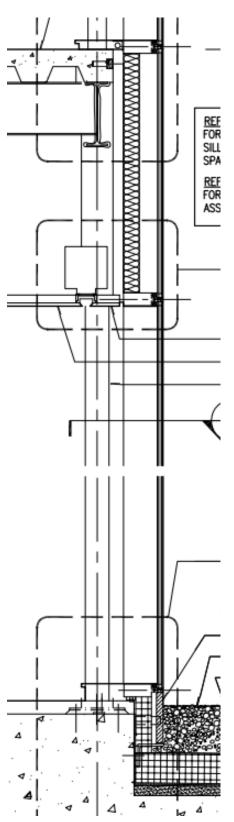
Glazing Curtain Wall Detail in Corridor
